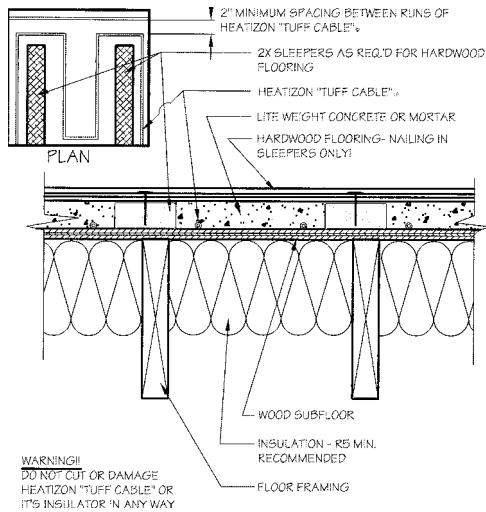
Tuff Cable under hardwood in lightweight concrete.
